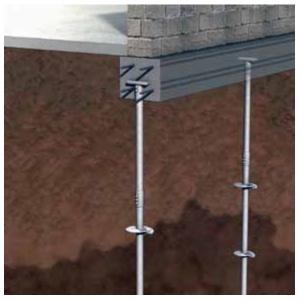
a1 Rendering of new construction helical piles cast into a structural grade beam
